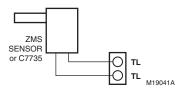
ZoneMAX or C7735 Sensor wiring diagram.
